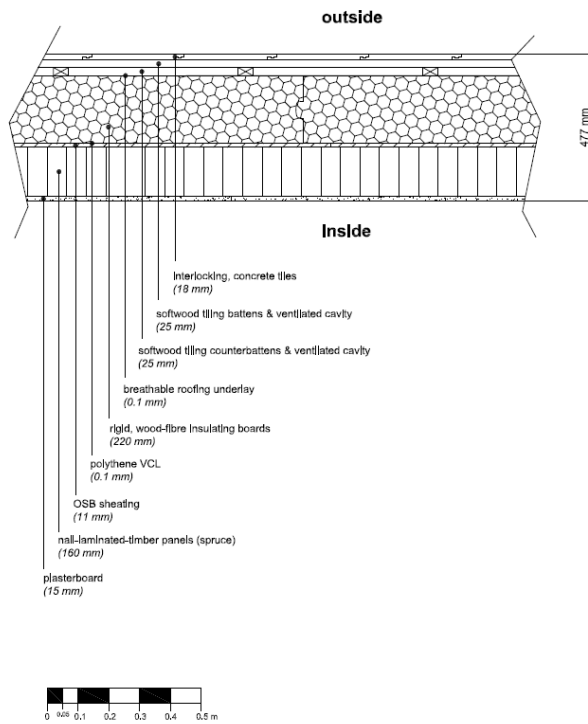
Roof E (nail-laminated timber (NLT)), cross-section.
